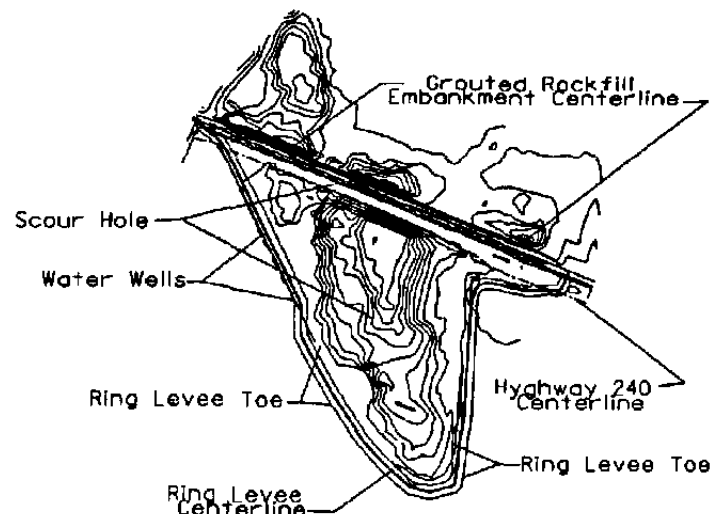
Cambridge Levee and Glasgow-Saline Railroad. Grouted Rockfill Embankment and Landward Ring Levee.
